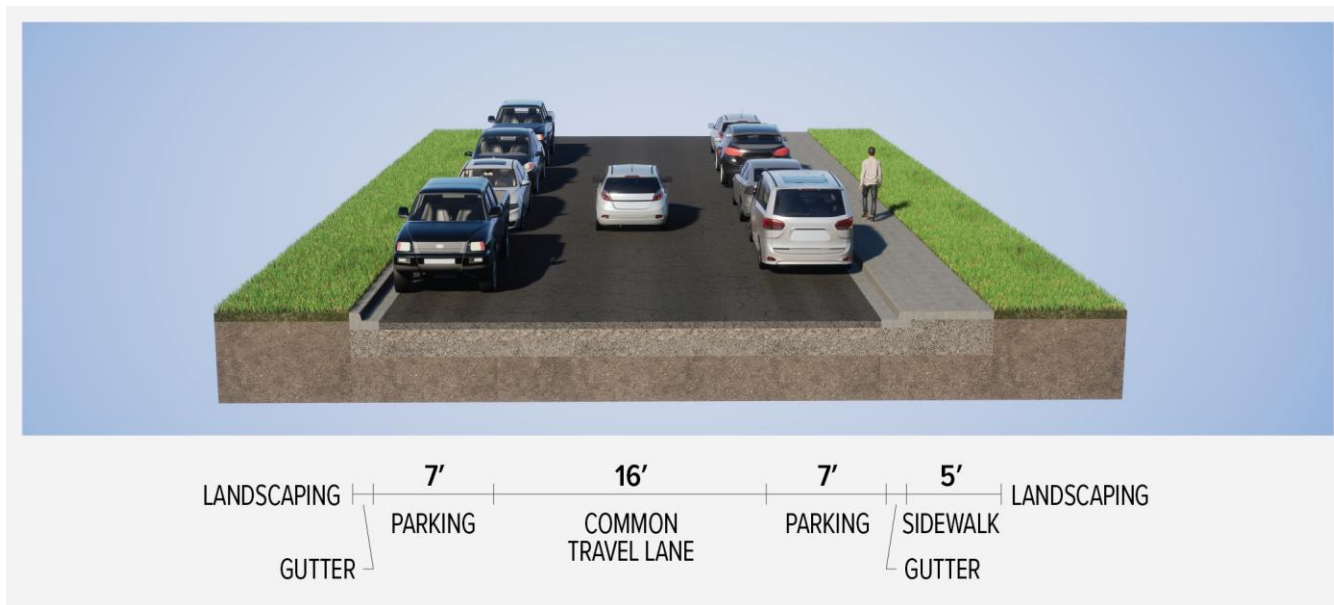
CROSS-SECTION OF HAWTHORNE AVENUE BETWEEN 4TH STREET AND 5TH STREET
